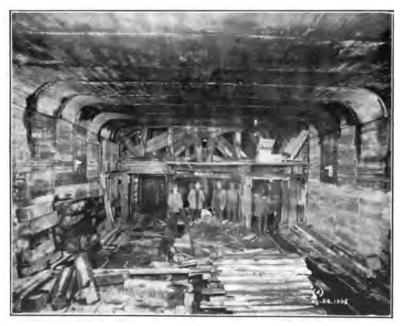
Partly Finished Section of Double Track Concrete Tunnel on Joralemon Street. Timbering Shown in the Baceground.
